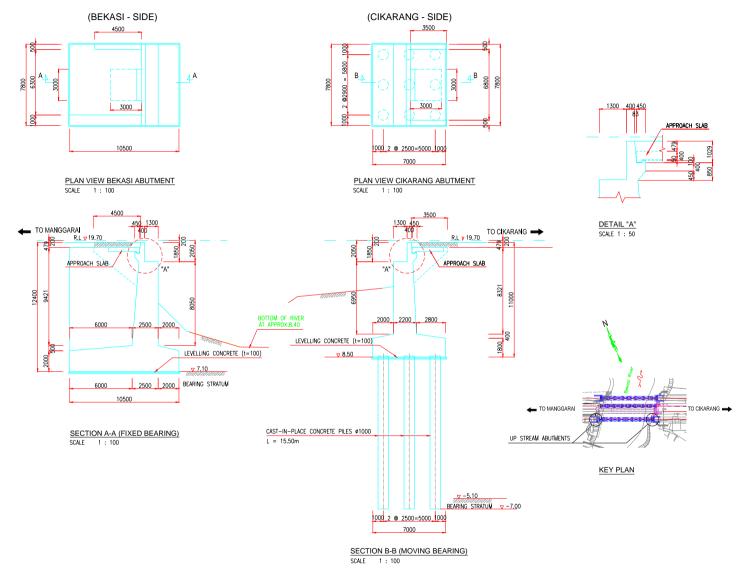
Bekasi Bridge – Upstream Abutments
